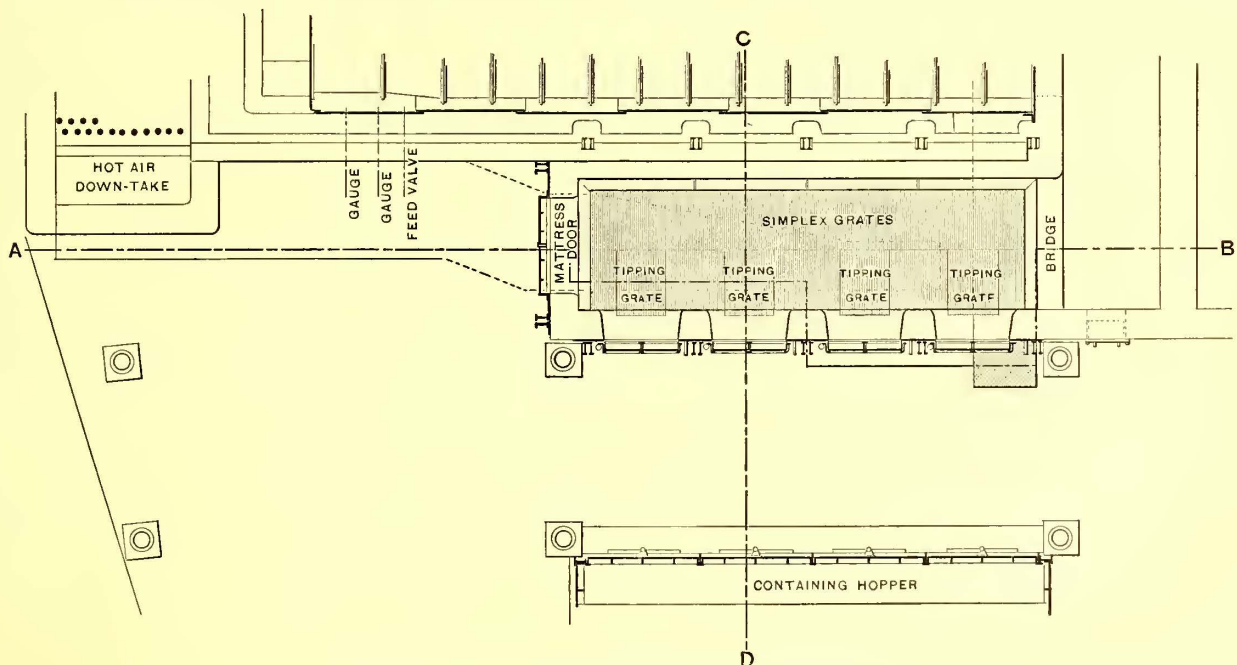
PLAN OF GRATE WITH BOILER SETTINGS
